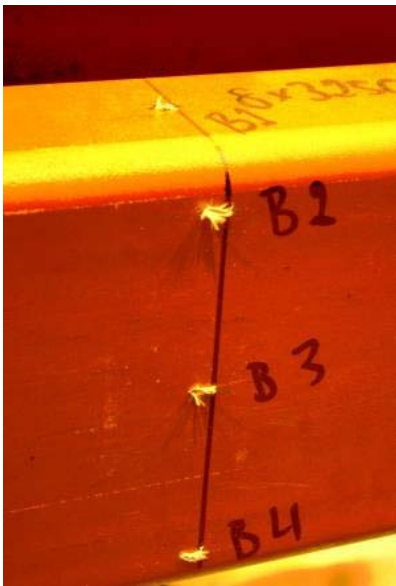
Quick-tip thermocouples were peened into drilled holes in the steel. The thermocouple wires were then drawn inside the square steel beam.
